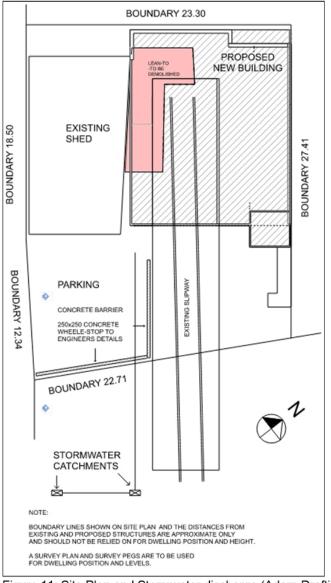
Site Plan and Stormwater discharge (Adorn Drafting, 2023)
